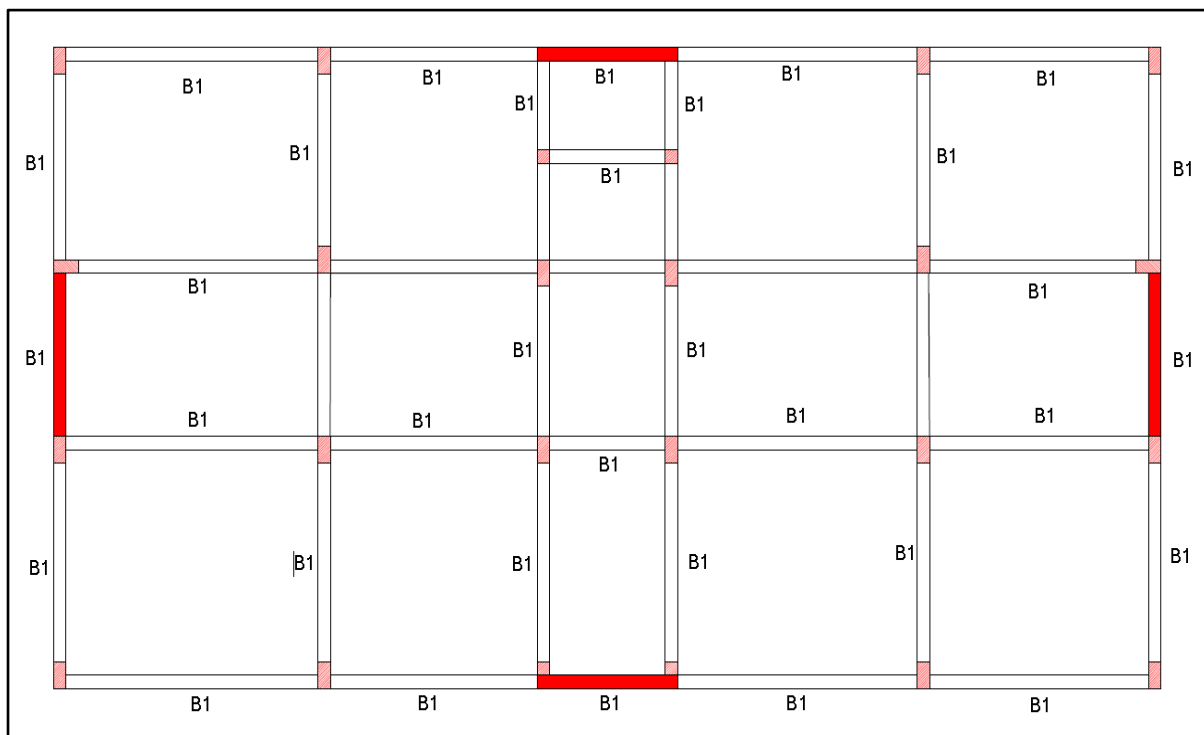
Shear Wall at middle along periphery of structure AutoCAD Plan
